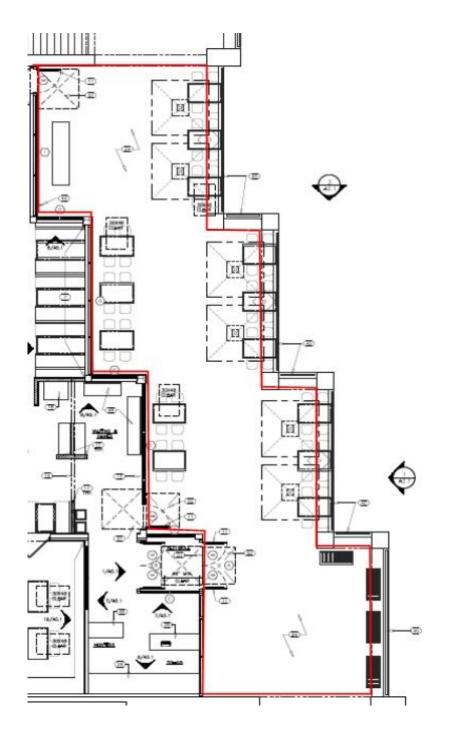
Proposed outdoor seating arrangement for 3141-3147 Duke Street outlined in red.
